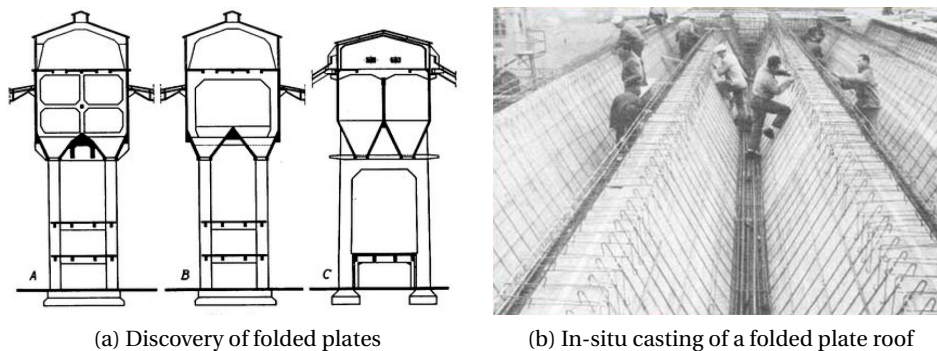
Origins of Folded Plate Structures - Left: Cross-section through coal-bunkers, A. 1915, B. 1921, C. 1925. [Cra29] Right: Folded plate construction through primary forming. In-situ casting and formwork of a roof construction
